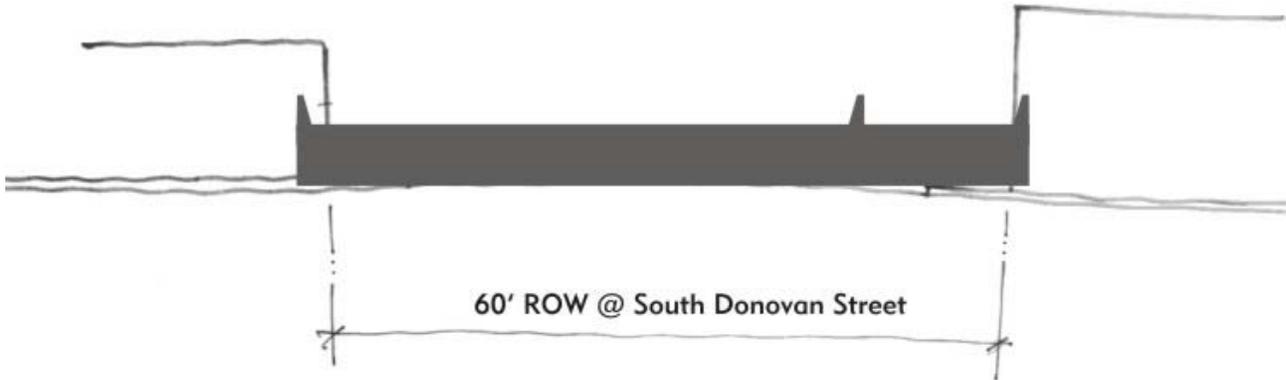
High-Level Fixed-Span Bridge Alternative at S. Donovan Street
